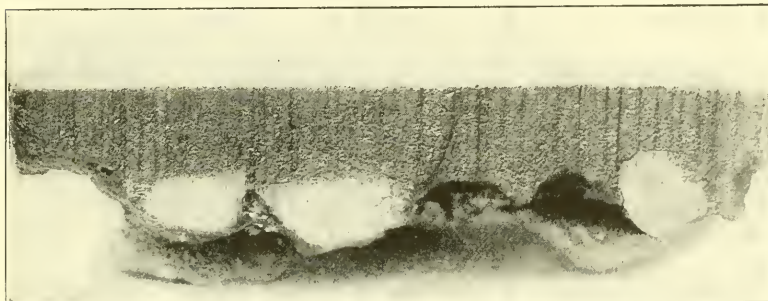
SEC. 7.—BITUMINOUS PAVEMENT, BUILT BY THE SICILIAN ASPHALT COMPANY, BY MACHINE-MIXING METHOD, USING "ASPHALTO" PAVING MIXTURE.
